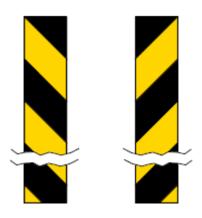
End of Bridge Parapet TSM Ch.4 7-4
